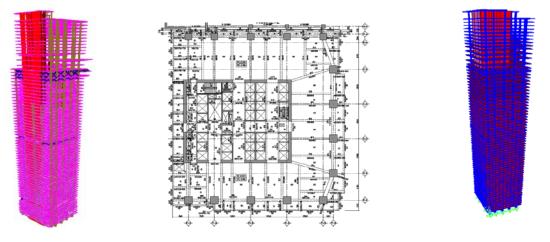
Structure Model Tower 1A (left), floor plan and Tower 1B (right)
